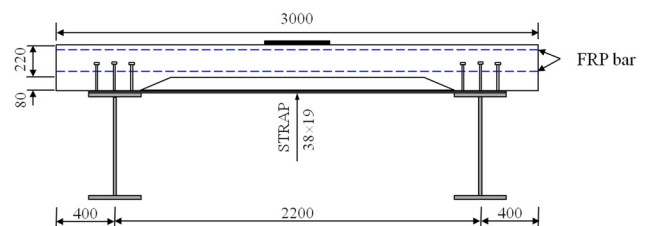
Cross-section of laterally restrained deck (unit: mm)
